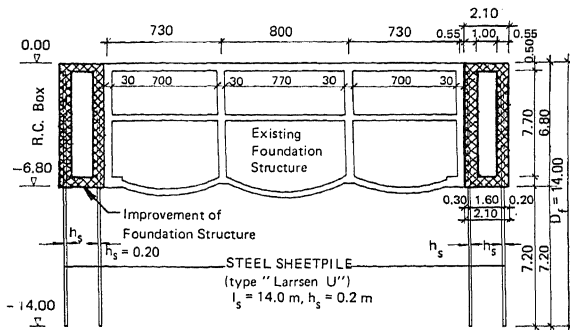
Cross-Section of the Existing and Improved Foundation Structure, Type M, Tlatelolco, Mexico D.F.
